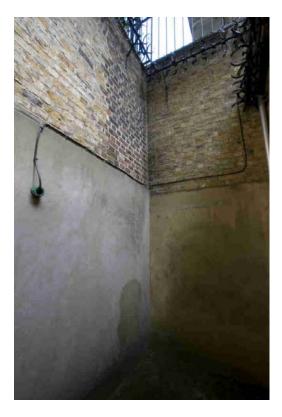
West elevation of the wall connecting the boundary wall to No. 1 Montague Place
